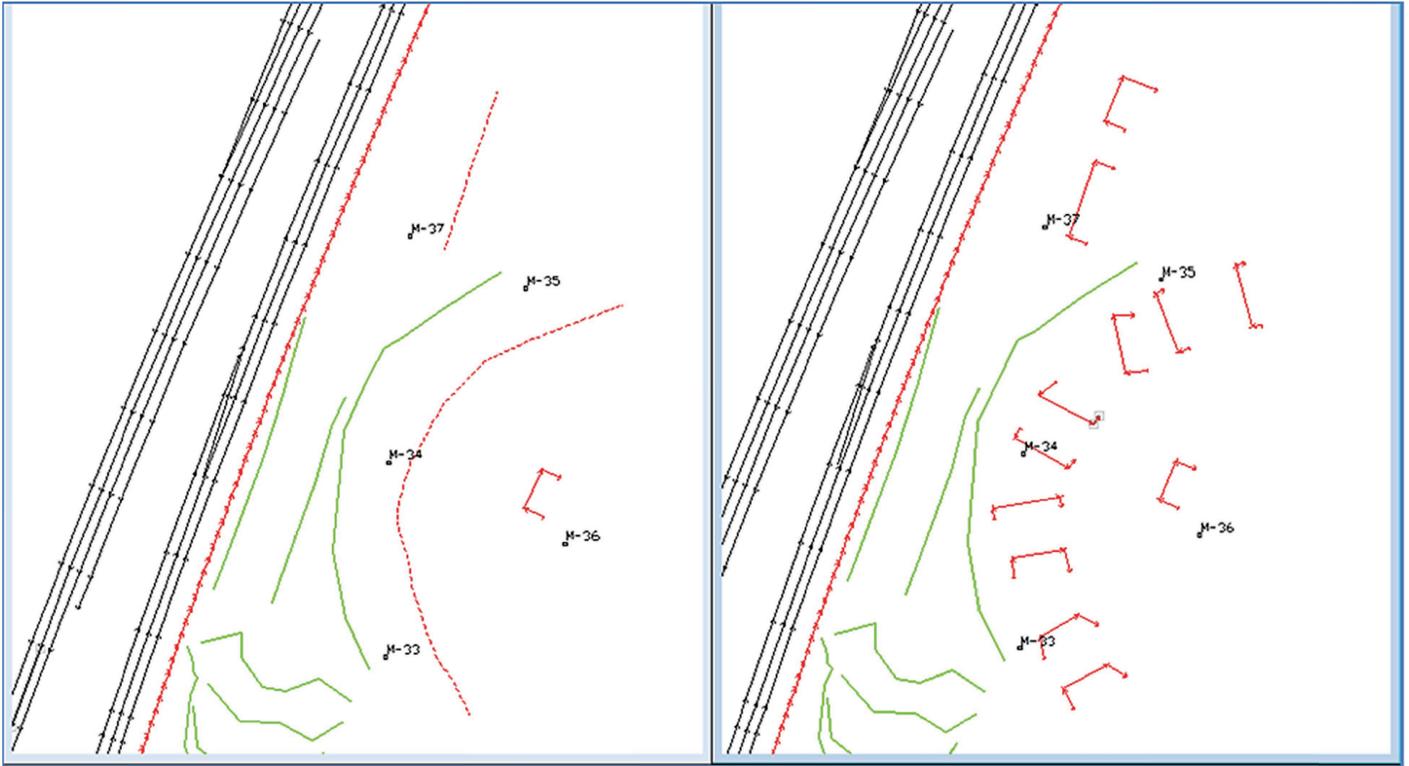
TNM plan view with building rows (left) and building barriers (right), Noise Study Area G of US 29 widening.
